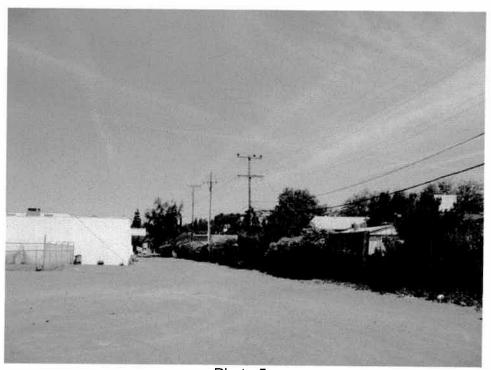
View of service drive aisle and east ½ of project site, facing north. Adjacent residential to the east.
